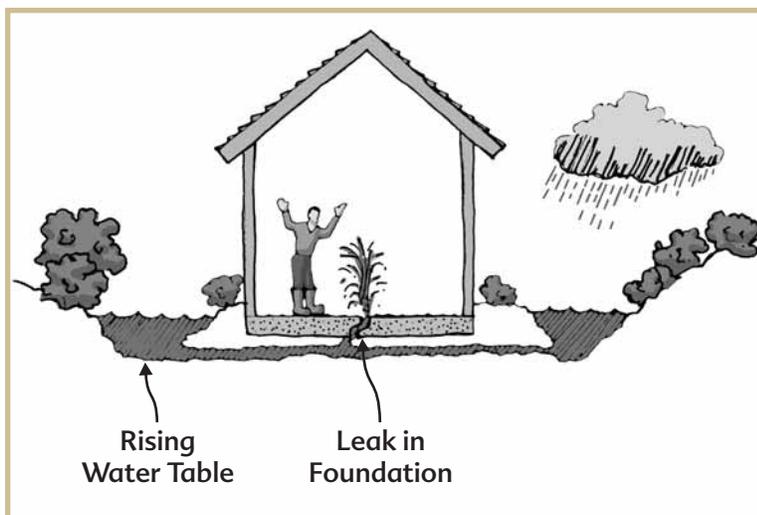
A crack in a foundation or a basement floor could become a serious leak if the water table rises after a heavy rainfall.
